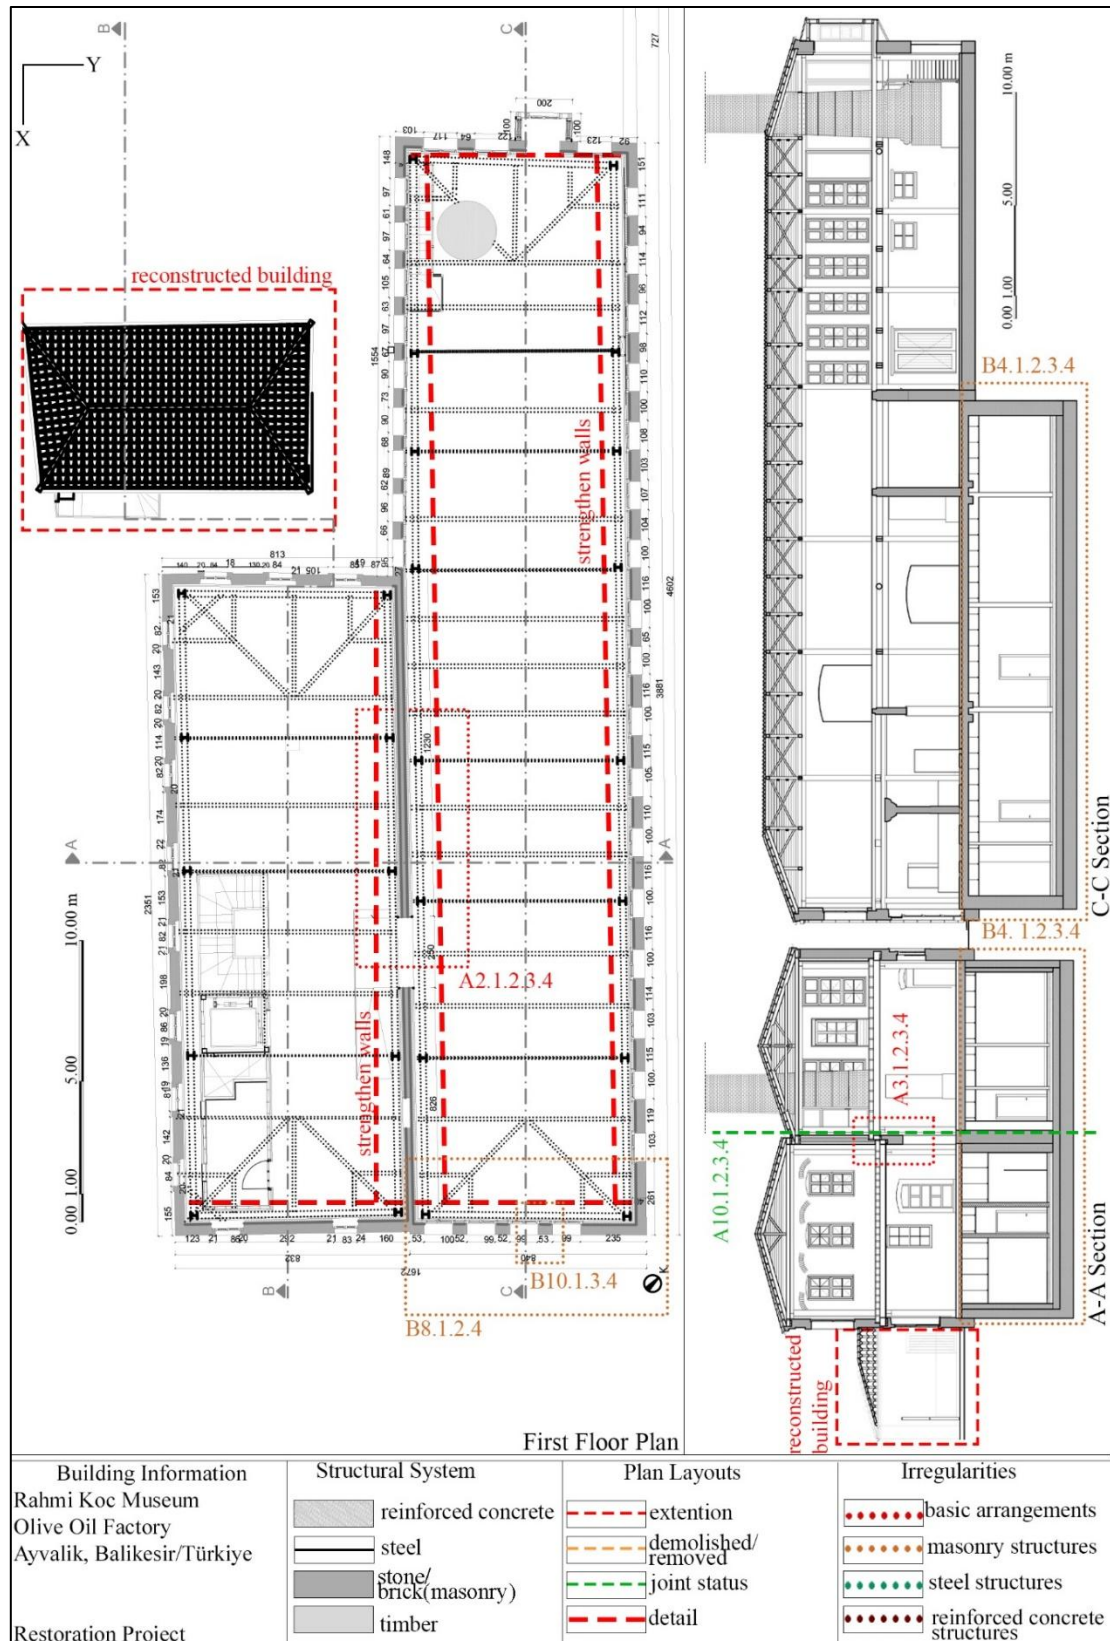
First Floor Plan and Sections (Modified by the author based on EMR Architecture, 2024.)
